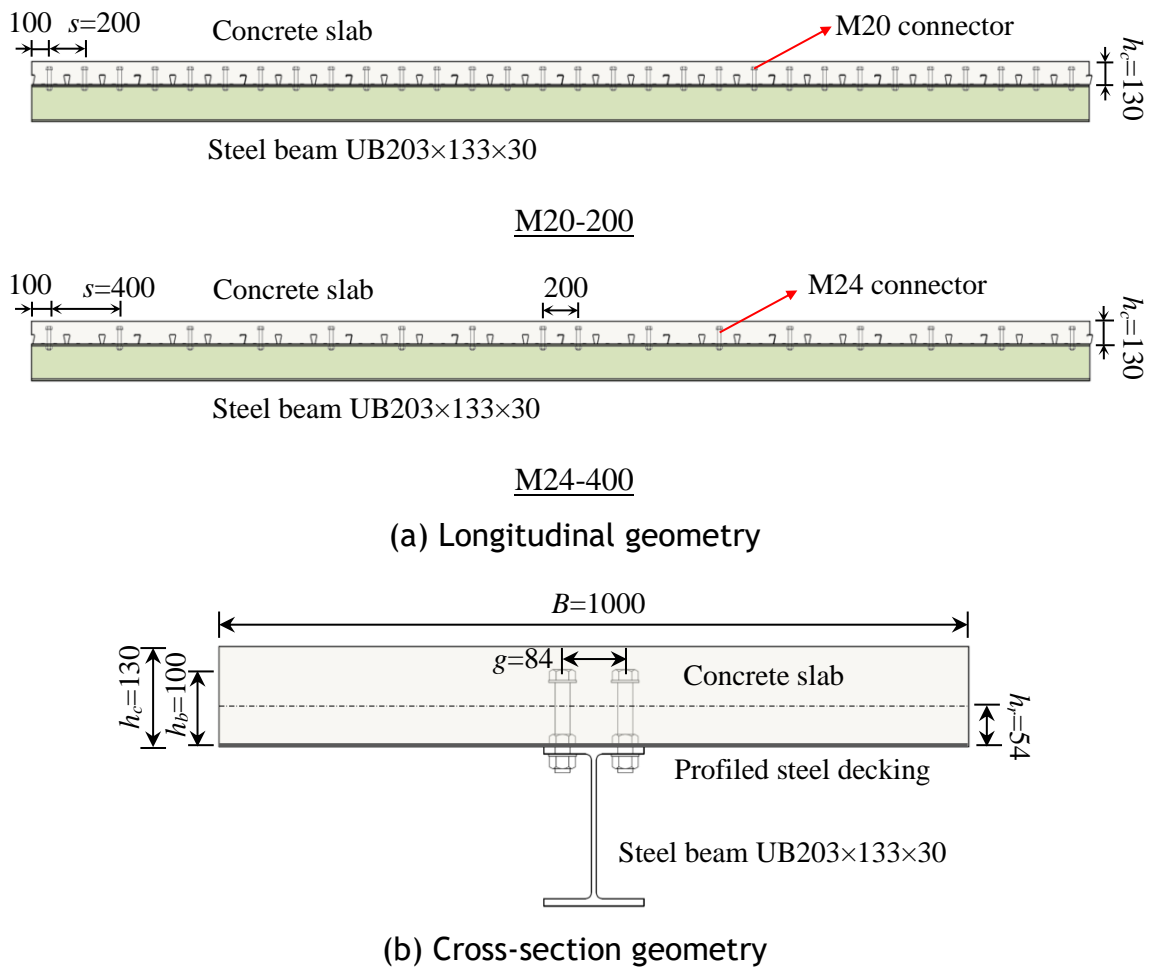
Geometric dimensions of typical composite beam specimens
